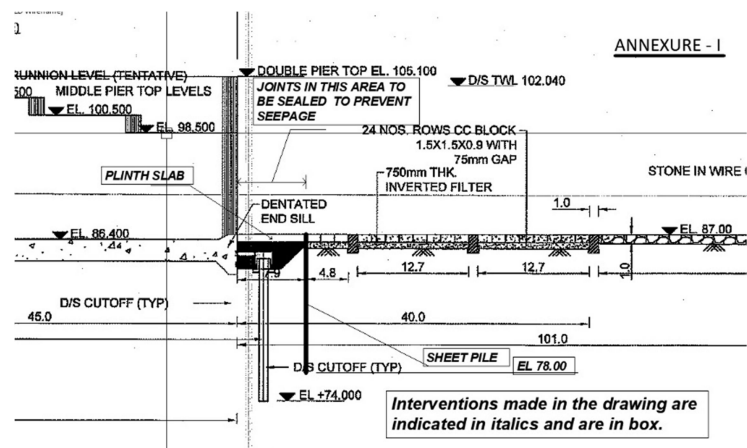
Location of sheet pile to be driven and area to be sealed at downstream plinth slab
